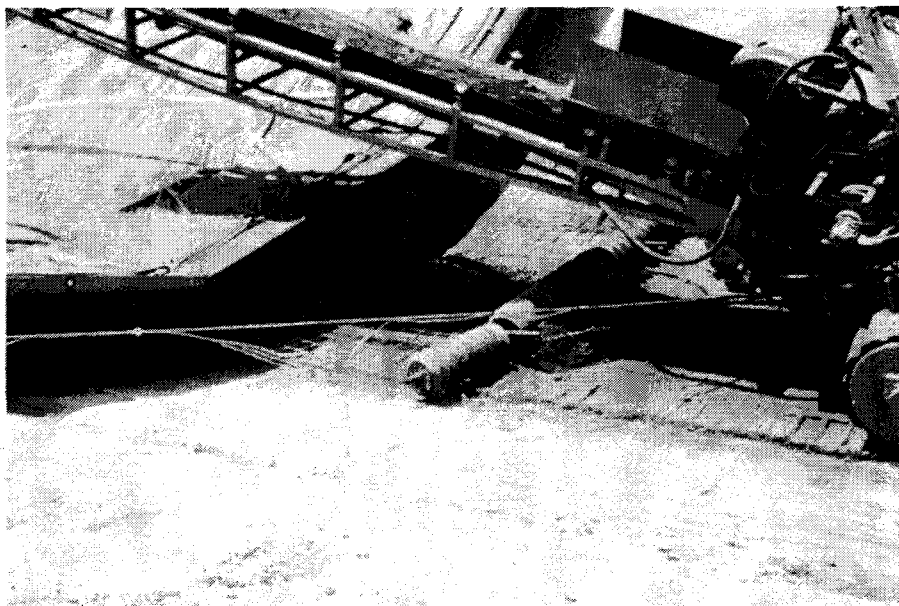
View of RAHCO trimmer showing screens, rollers, etc., attached between excavator portion and PVC which are used to remove ridges and bumps prior to installation of the geomembrane and protective soil cover.
